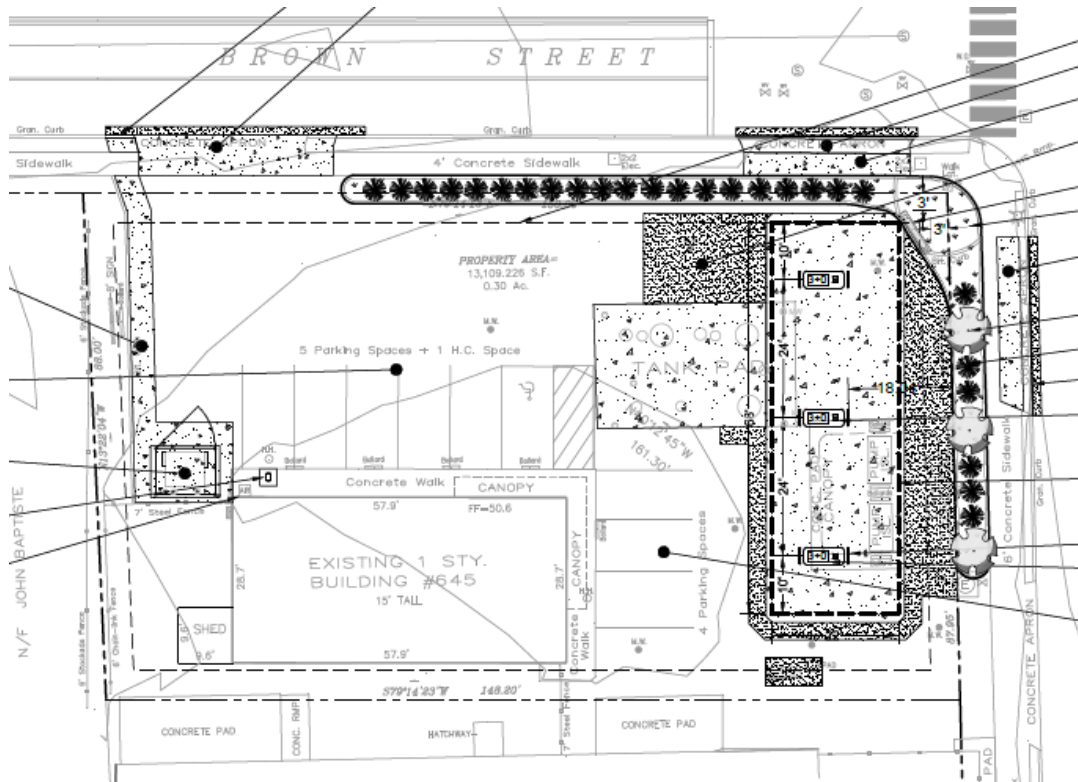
Proposed Conditions Site Plan – Benesch 2022
